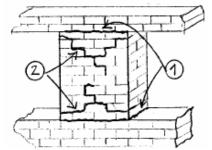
The crack type considered for the walls based on FEMA-306 (λ_k =0.8, λ_O =0.8)
